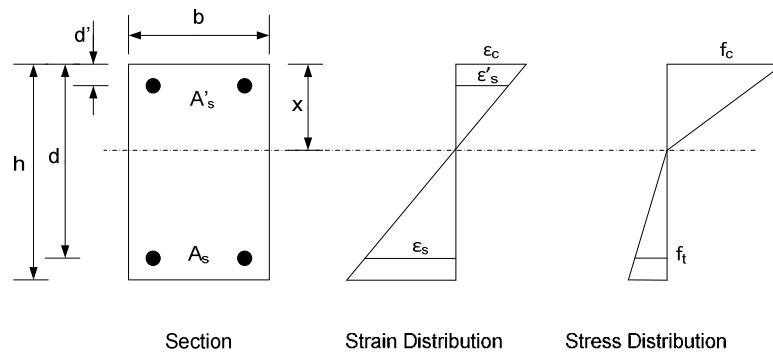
The Partially Cracked Reinforced Concrete Section (Kong and Evans, 1987).
